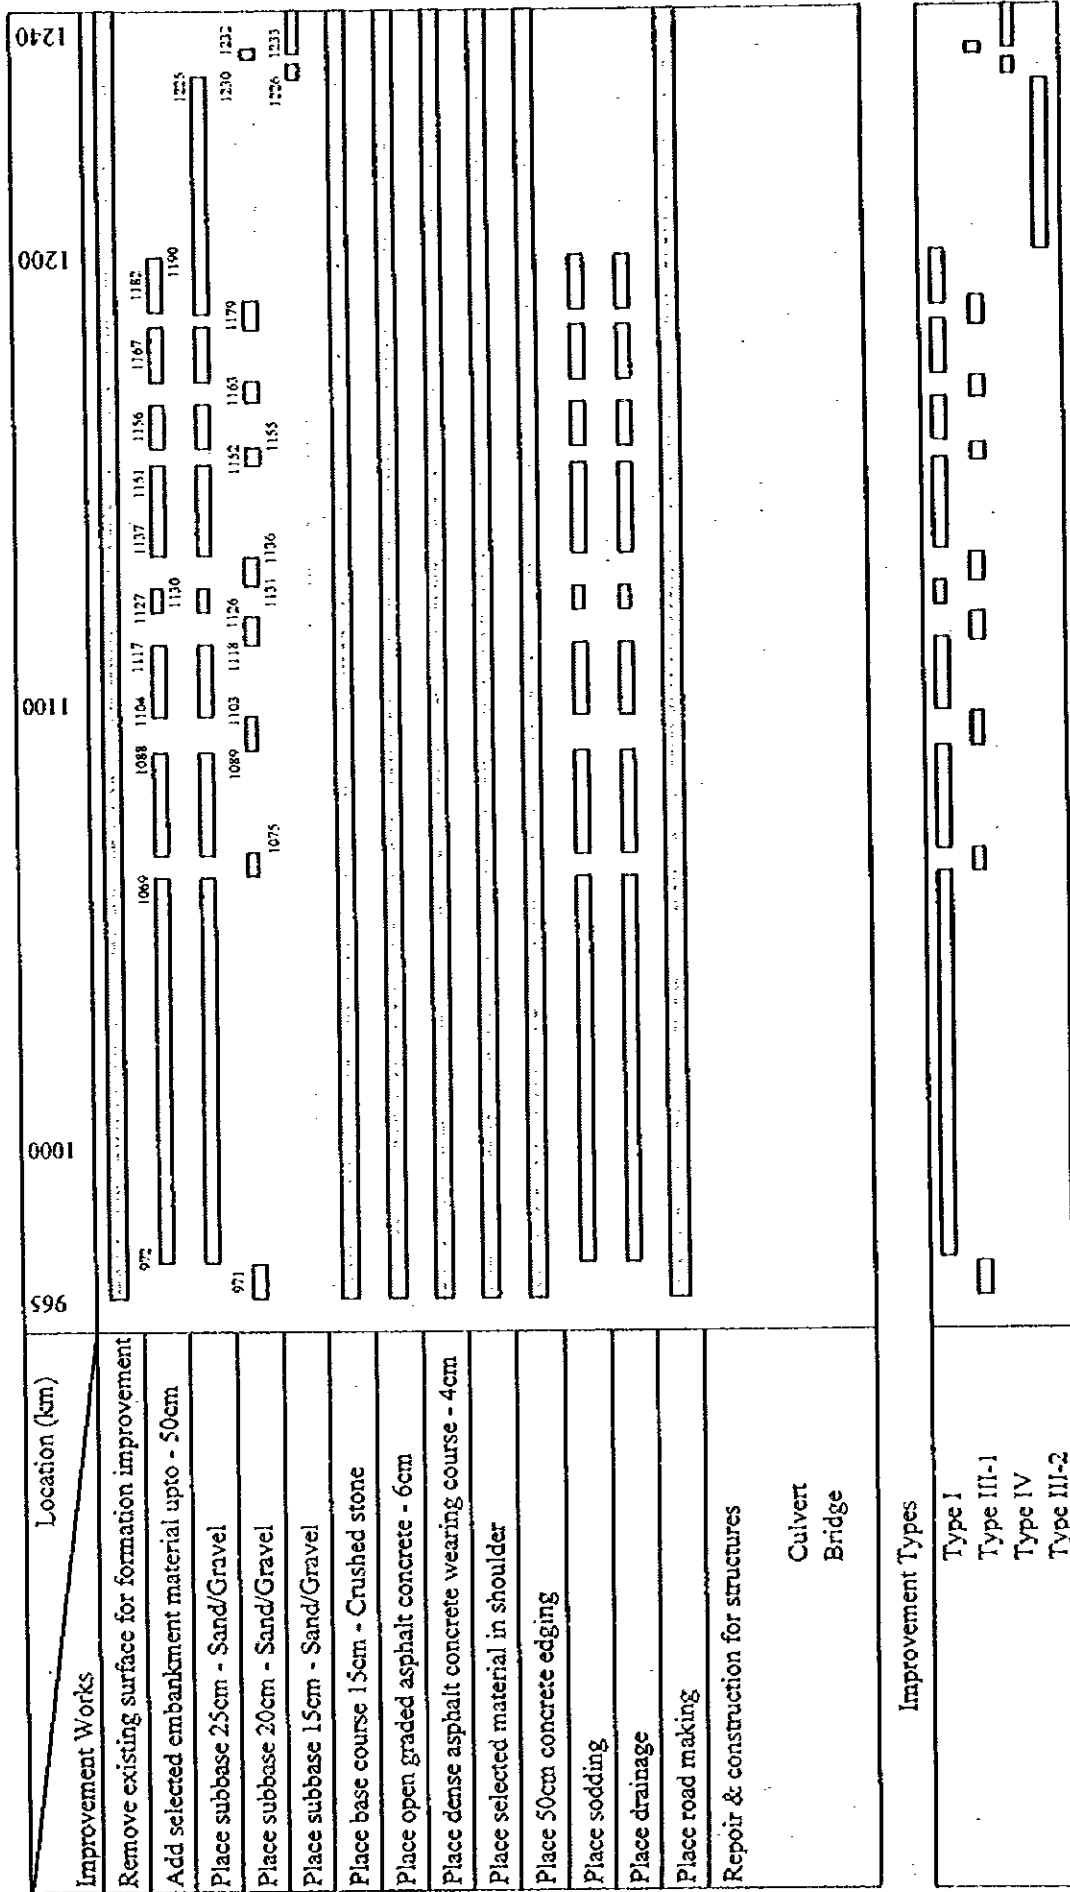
(1) : Road Improvement Plan on the Karabutak ~ Kzyl Orda Border road section
